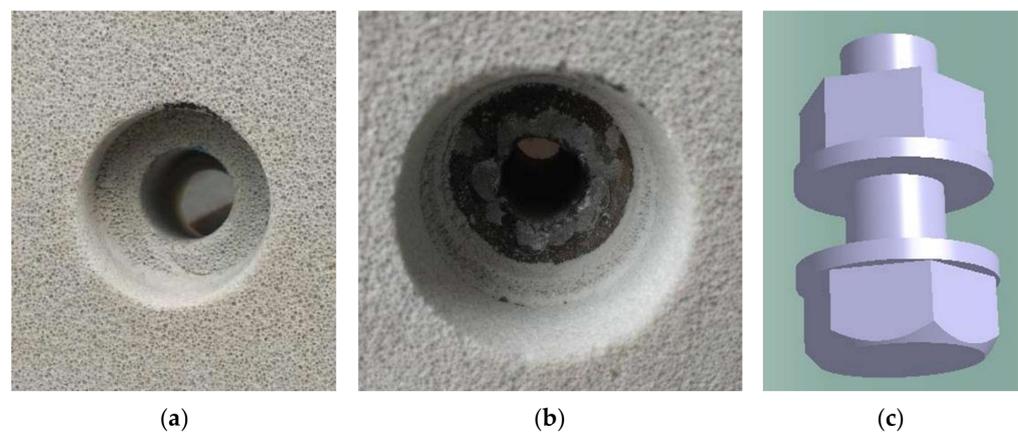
Connection structure of composite wallboard with foamed ceramic and foamed concrete: (a) penetrating round hole; (b) sleeve placed in long hole; (c) connecting bolt locking sleeve.
